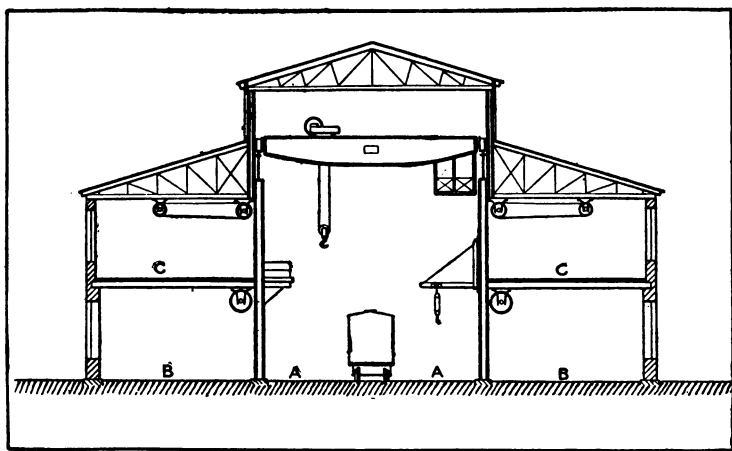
TYPE OF BUILDING ADAPTED TO LARGE AND SPECIAL WORK
